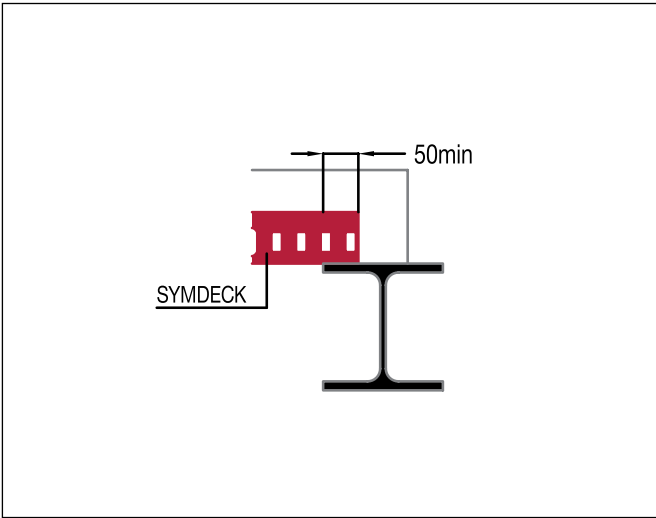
DETAIL OF COMPOSITE FLOOR WITH DIRECTION CHANGE
